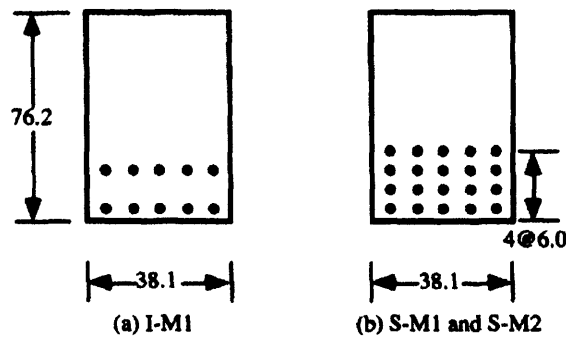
Cross-section of flexural specimens, showing position of glass fibres (units in mm) (Li et al., 1998)
